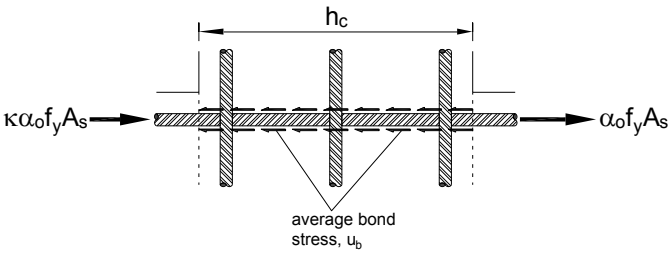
Free body diagram of a reinforcing bar anchored in a beam-column joint core
